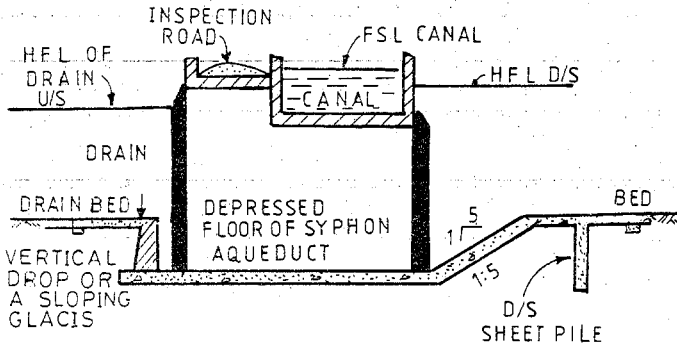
Typical cross-section of a Syphon Aqueduct.
